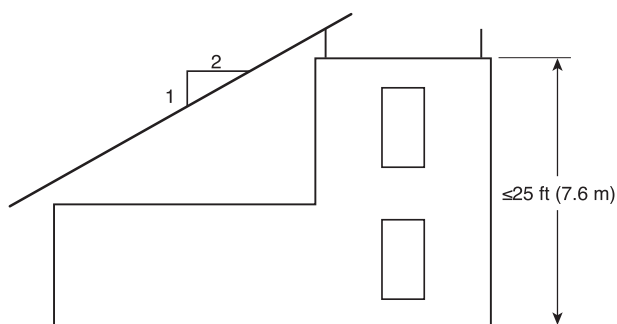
(a) Lower Roof Protection for Flat-Roof Buildings 25 ft (7.6 m) or Less in Height.
